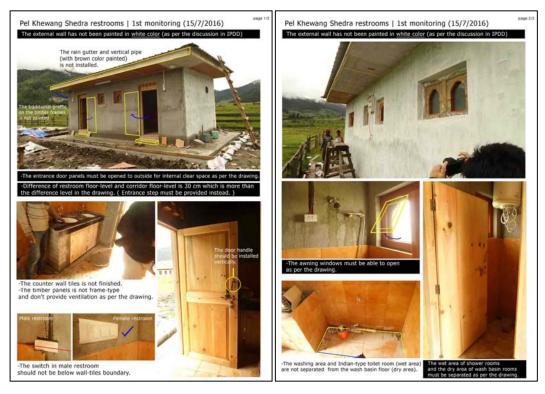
Monitoring reports of Khewang Sheddra restrooms construction.
